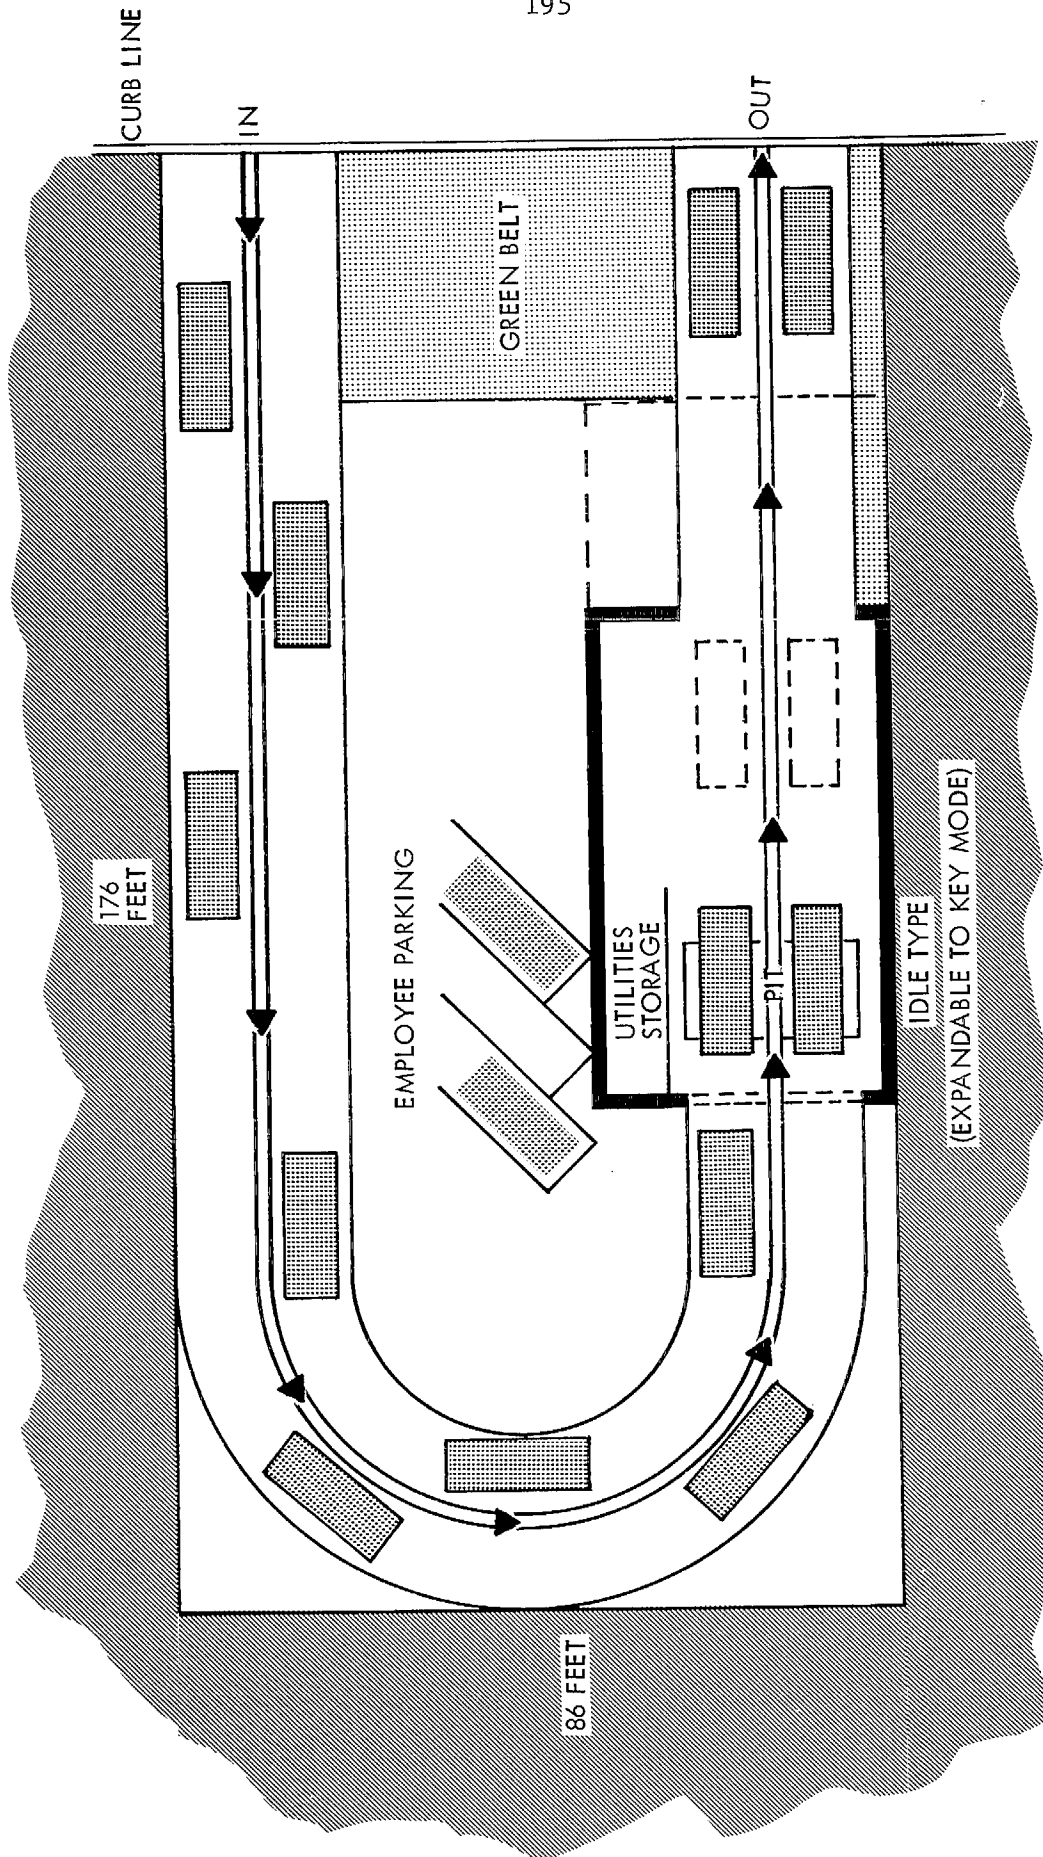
TWO-LANE STATION FLOOR PLANS (Sheet 3 of 3)
